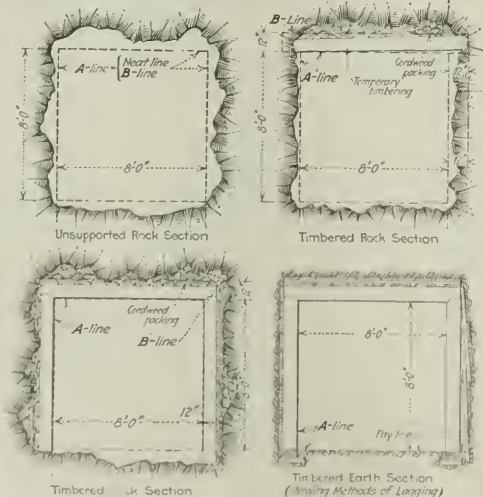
SECTIONS OF PILOT TUNNEL, CROSS CUTS AND MAIN HEADINGS
